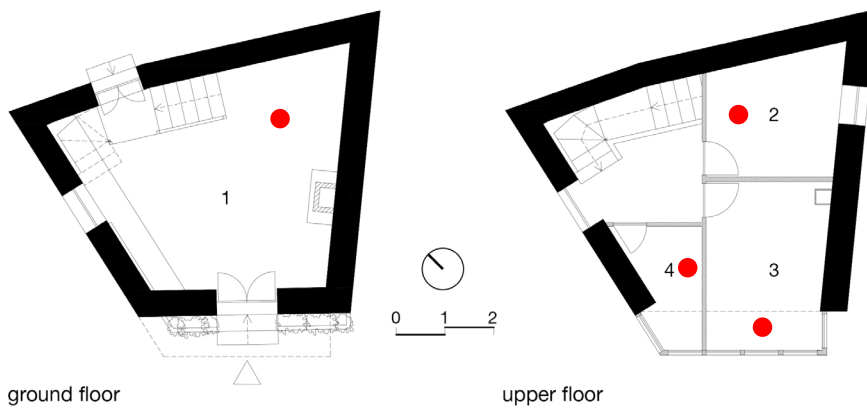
Floor plans showing the location of measuring instruments (1 - living room / kitchen; 2 bedroom; 3 - bedroom with balcony; 4 - bathroom).
